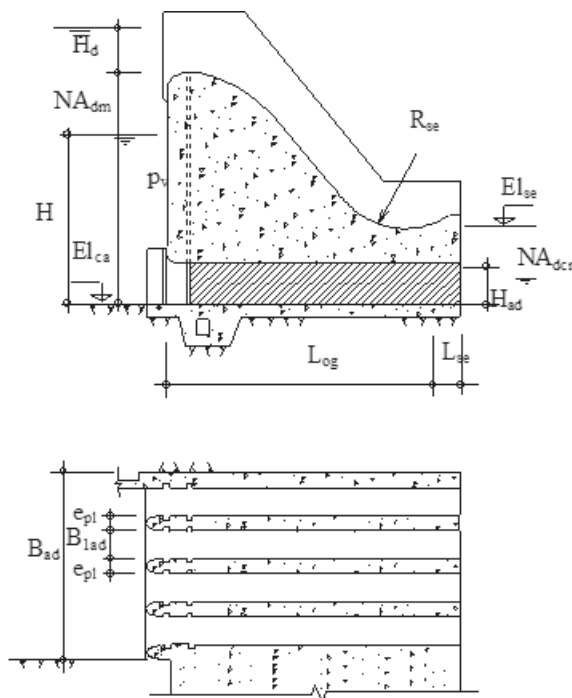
Typical cross-section and plan of sluiceways through spillways with a high ogee crest and a ski jump.
